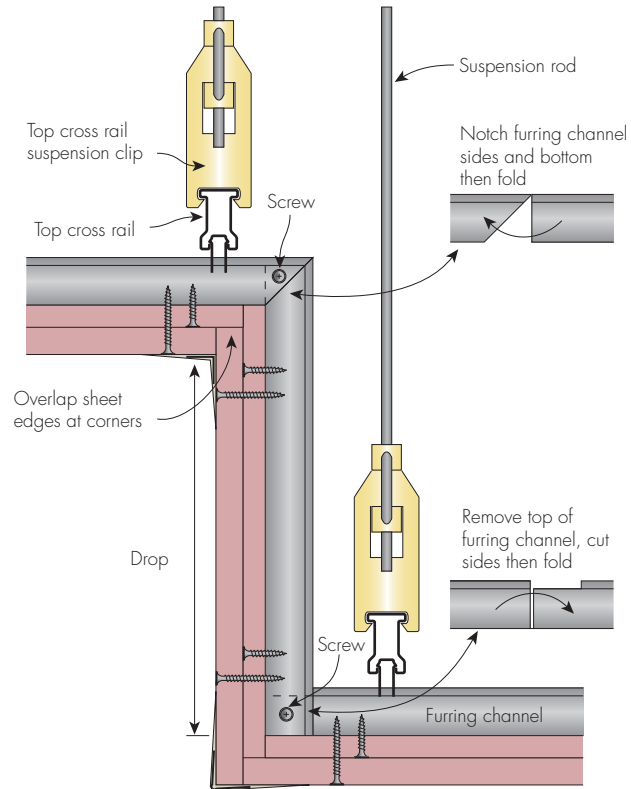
Suspended Ceiling Bulkhead – Elevation
